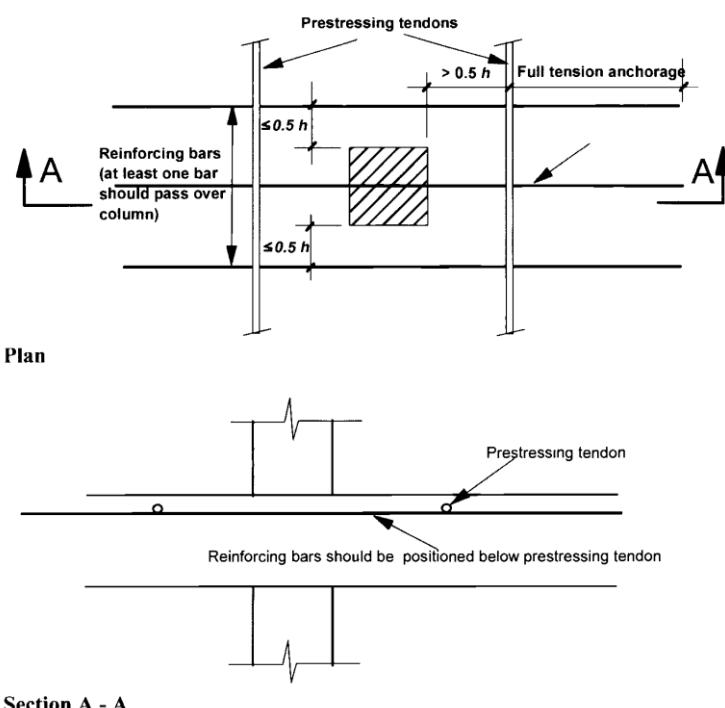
Additional reinforcement required where tendons are not within 0.5h from the column.
